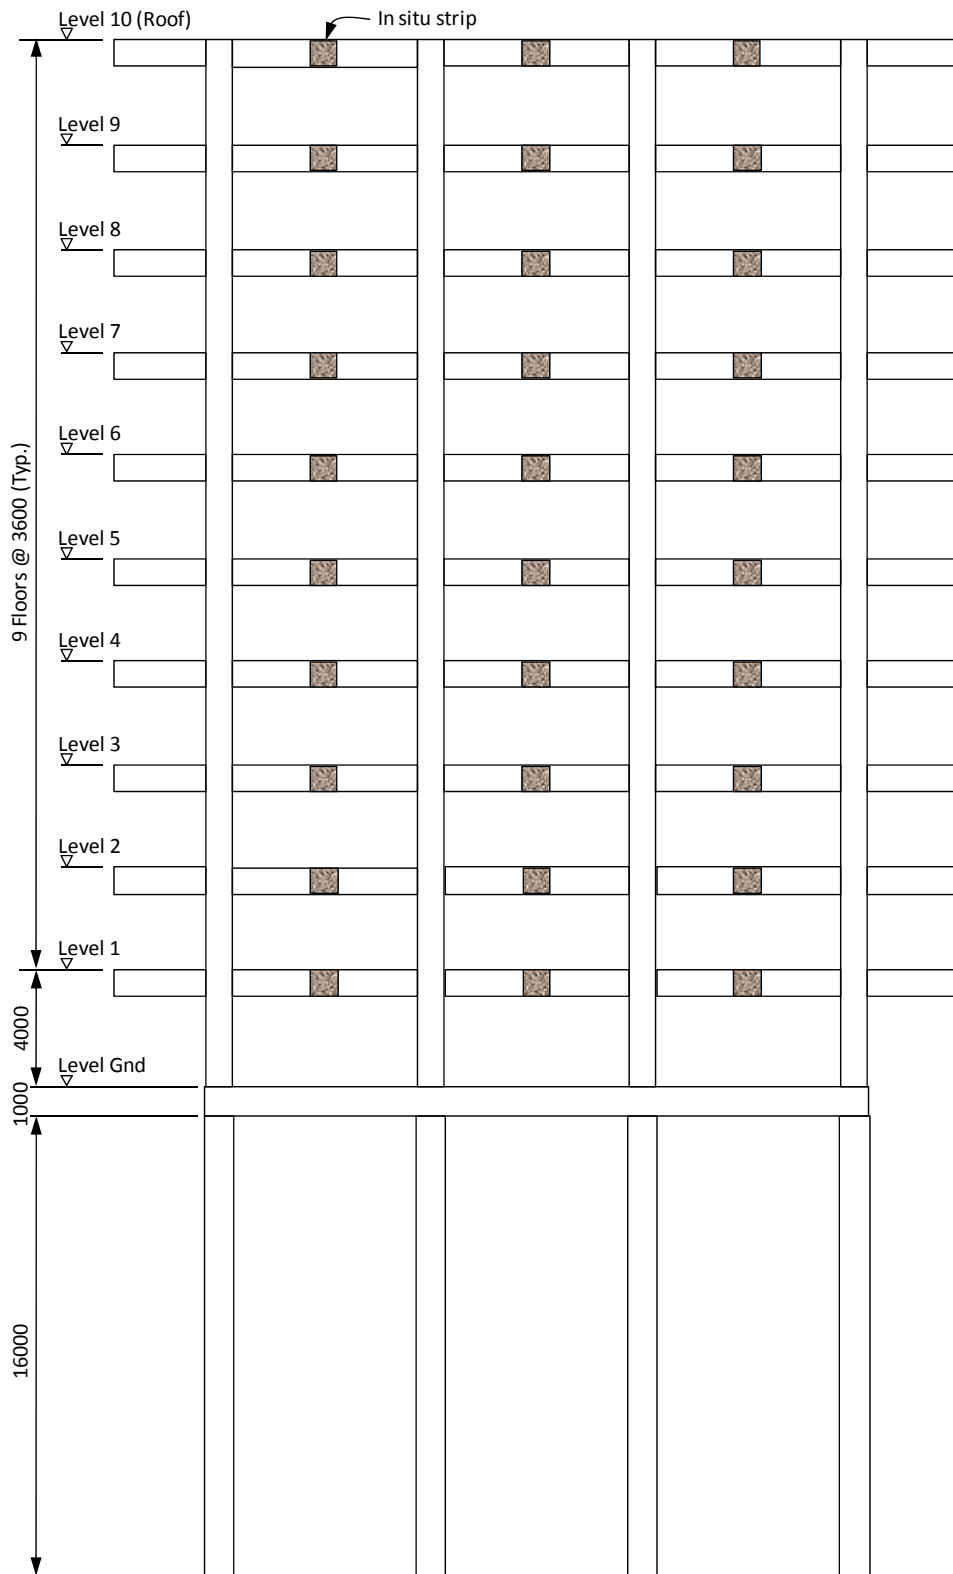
Red Book Building (adapted from CCANZ, 1998) – Grid F Elevation
